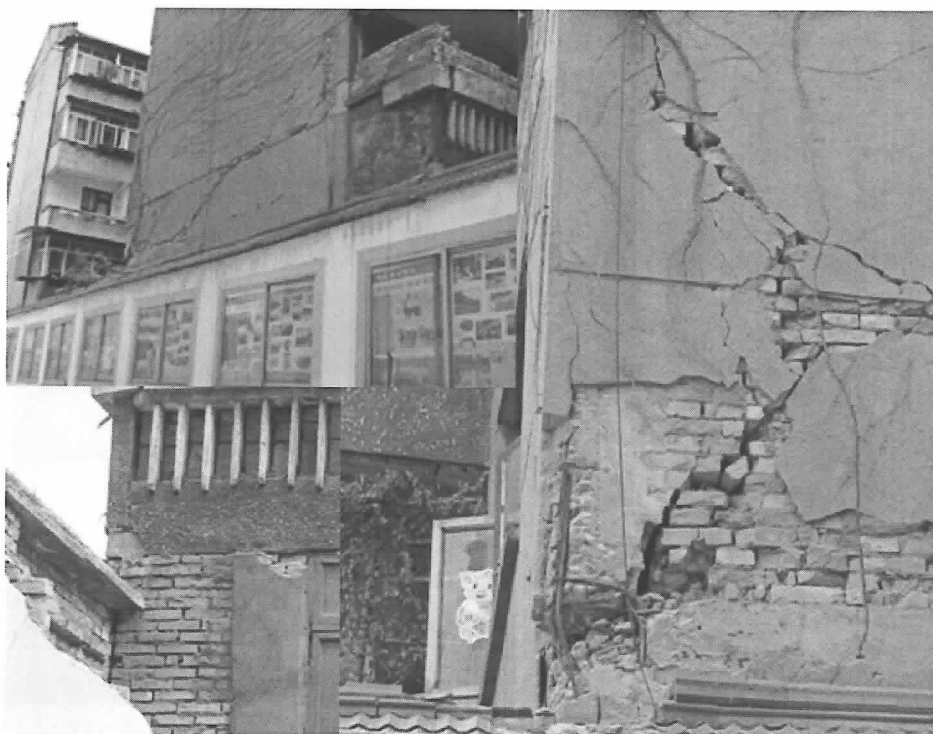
Wall damage of masonry structure with a surrounding wall in Mianzhu
